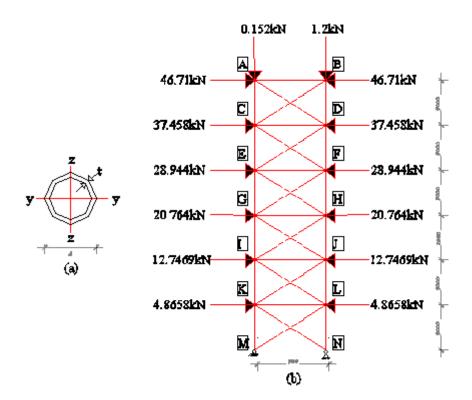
a - Hot-Finish circular hollow section of the main poles and b - elevation.
